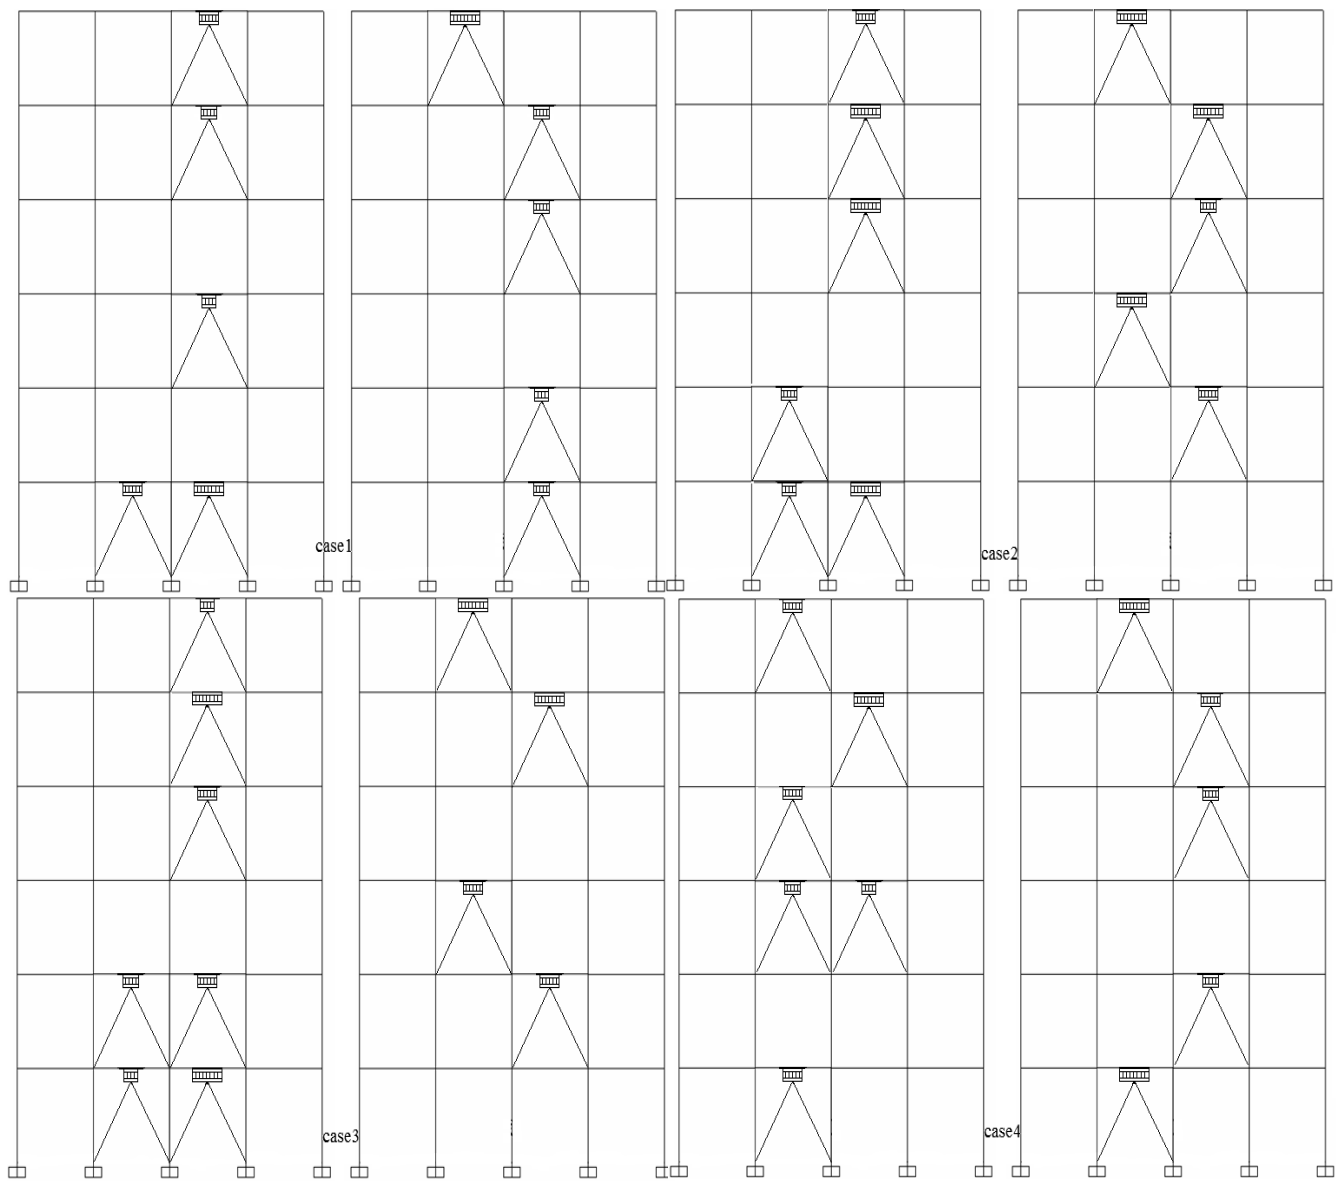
The proposed four distributions of TADAS dampers in 6 story building
